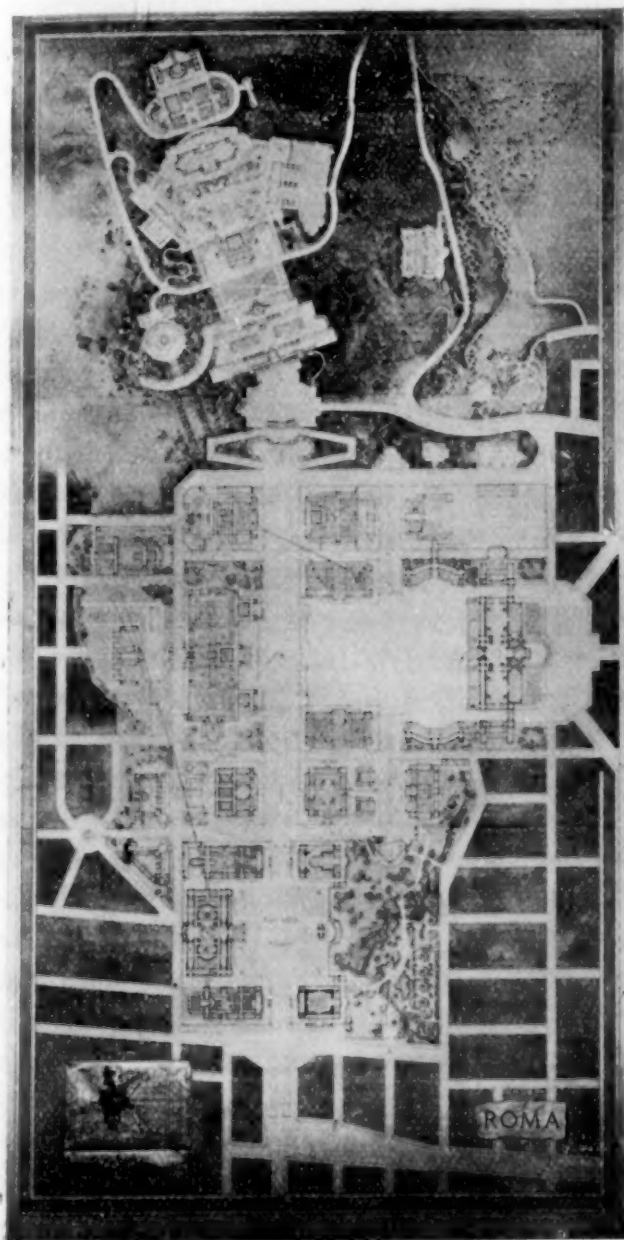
General plan and skeleton plan of buildings for the University of California.
